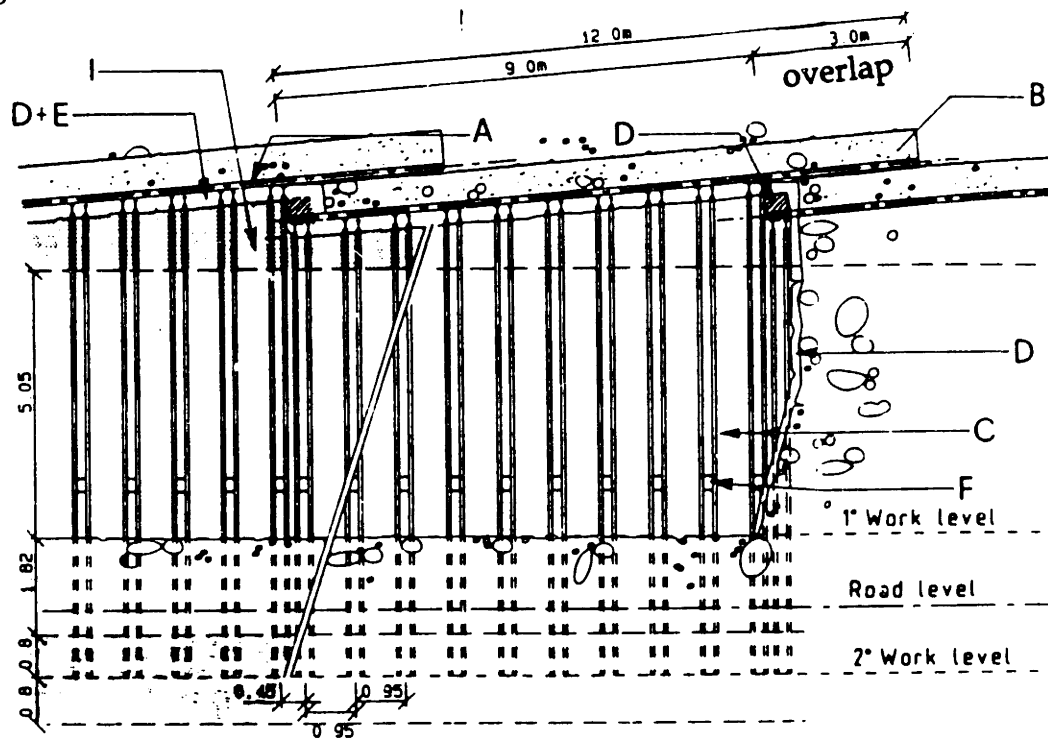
Cross and longitudinal sections: Lonato Tunnel (Mahtab et al., 1992)
